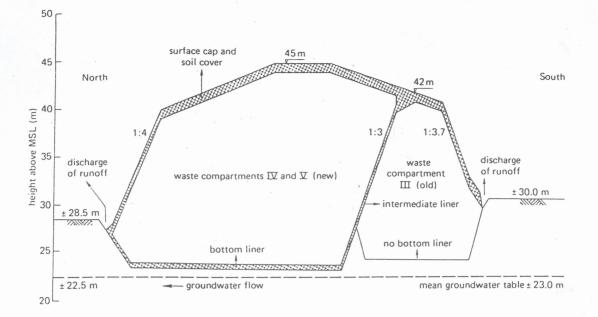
Outline in cross-section of the final constellation of the waste disposal site, with respect to liners and build-up. MSL = mean sea level
